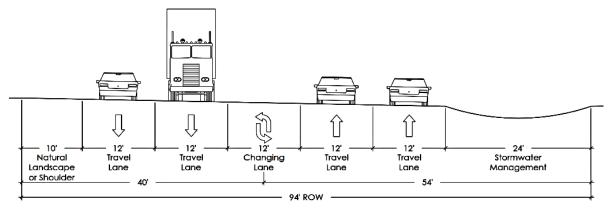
W. Marshall Road (looking east) Cross Section for Segment Adjacent to CLIBP
